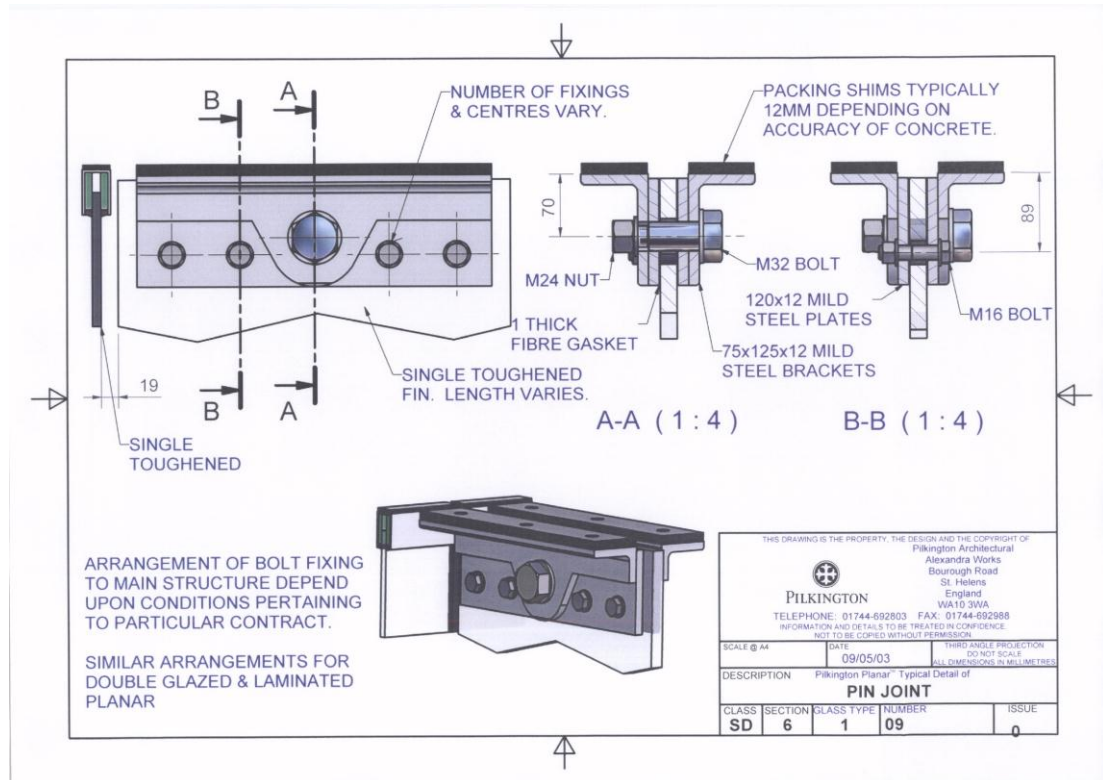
Detailing of Glass Fins and their Brackets (Pilkington, 2009)
